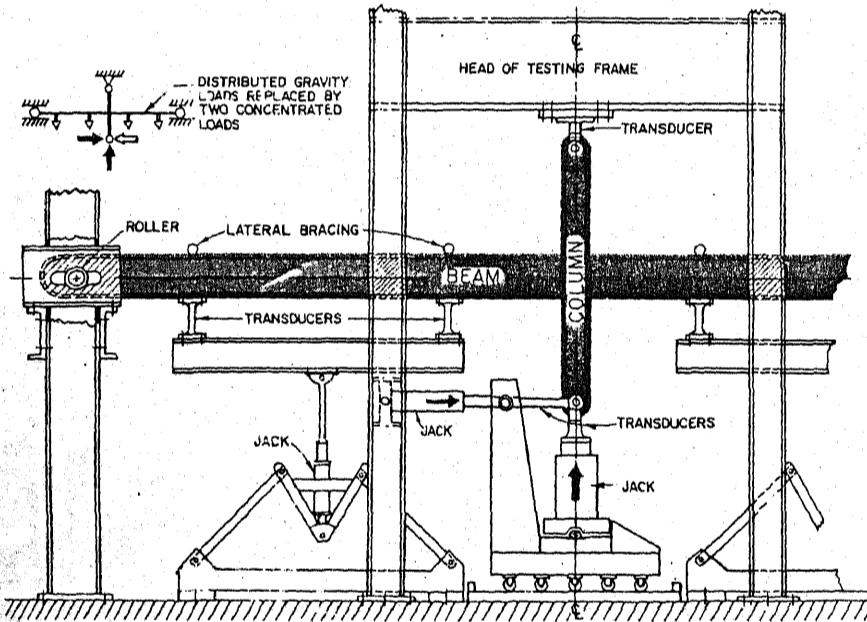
SET-UP FOR TESTING BEAM-TO-COLUMN CONNECTION
